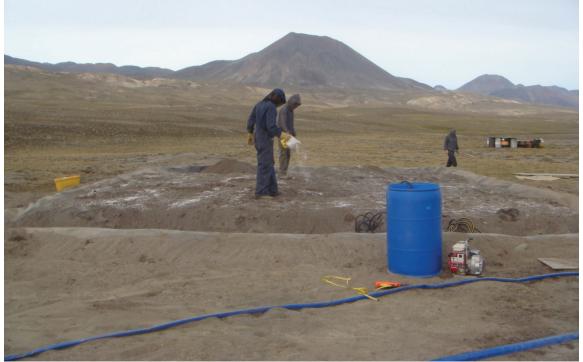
Construction of the Lake Hazen landfarm: geotextile liner with silt and gravel layer being constructed.
